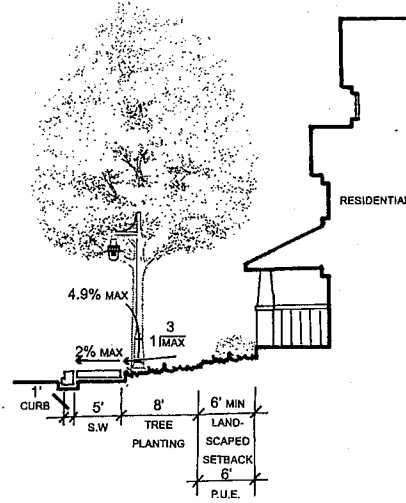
D.New.j: (Option B) Harbor Way Partial Cross Section at Parking with Monolithic Sidewalk ①
